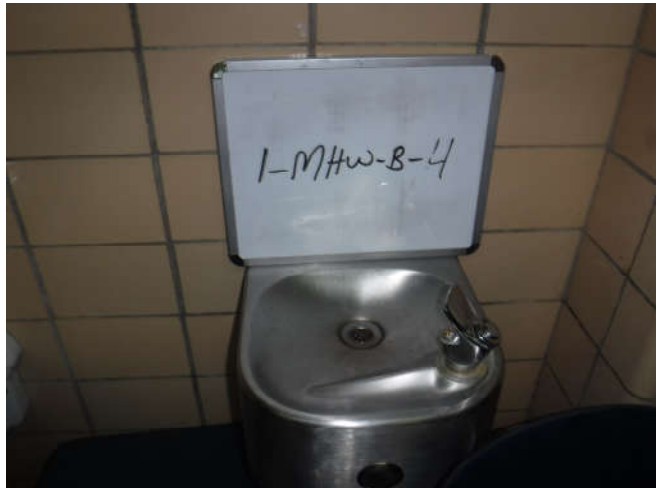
Across from room 105 & stairs to 2nd floor (right) (Middle School)
